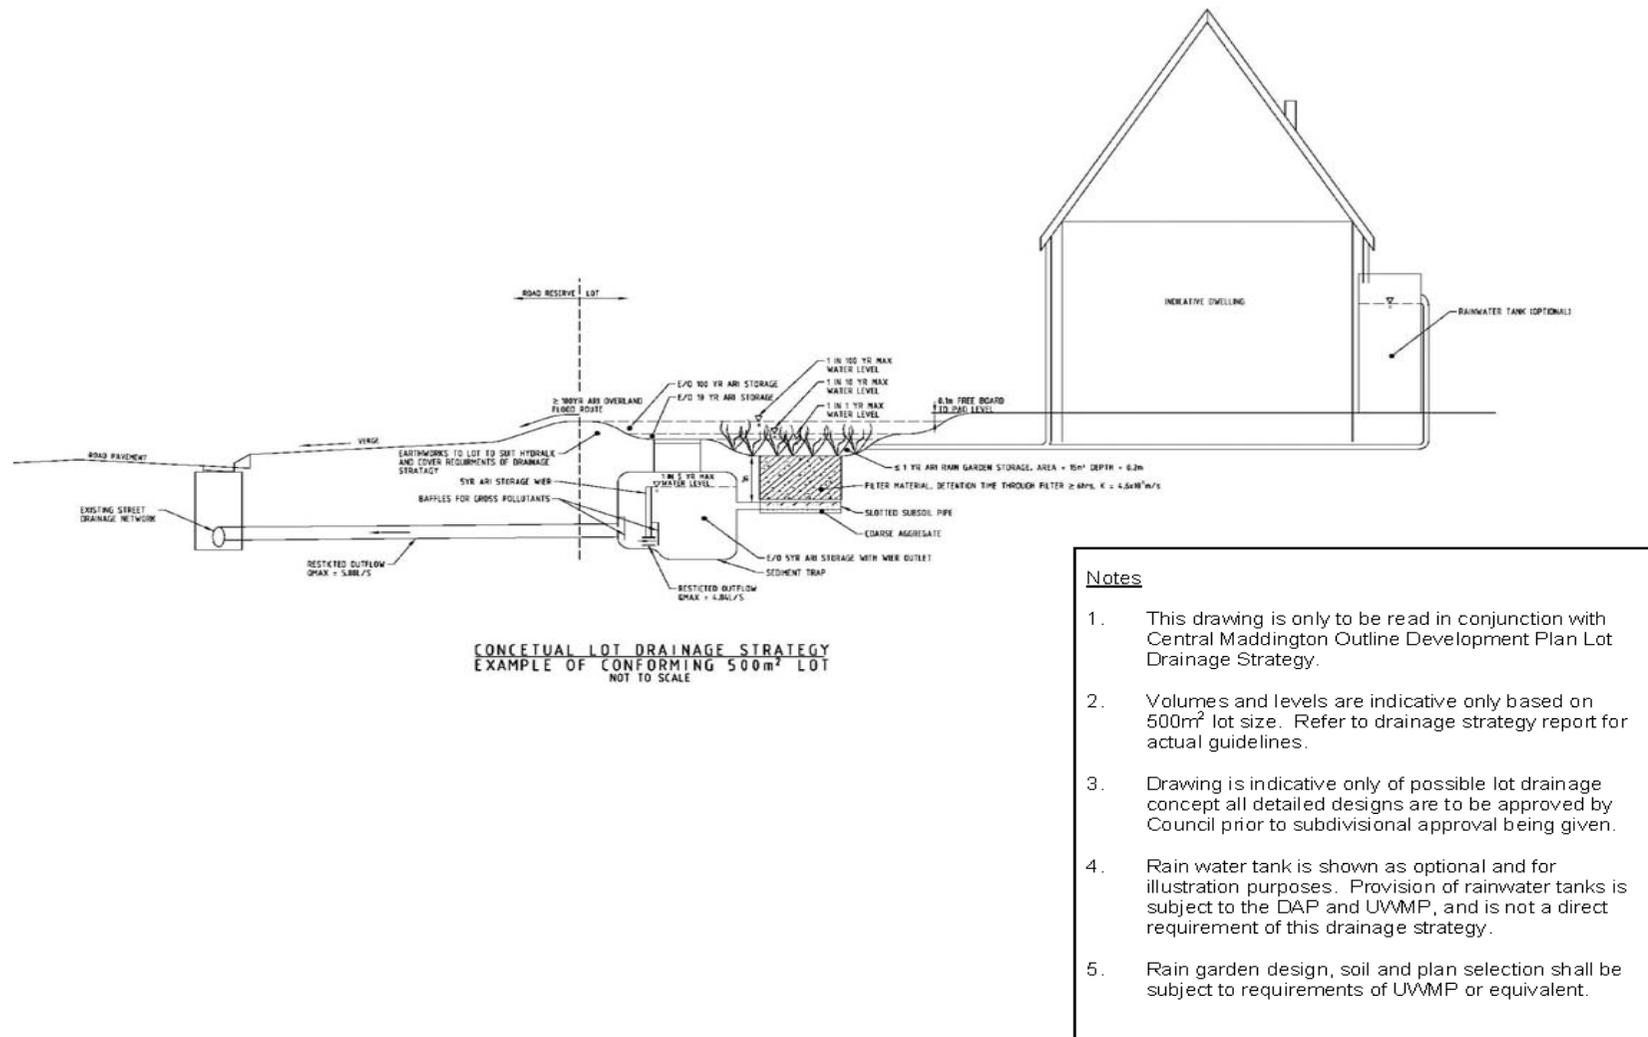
8 – Lot Drainage Strategy - Concept Plan
